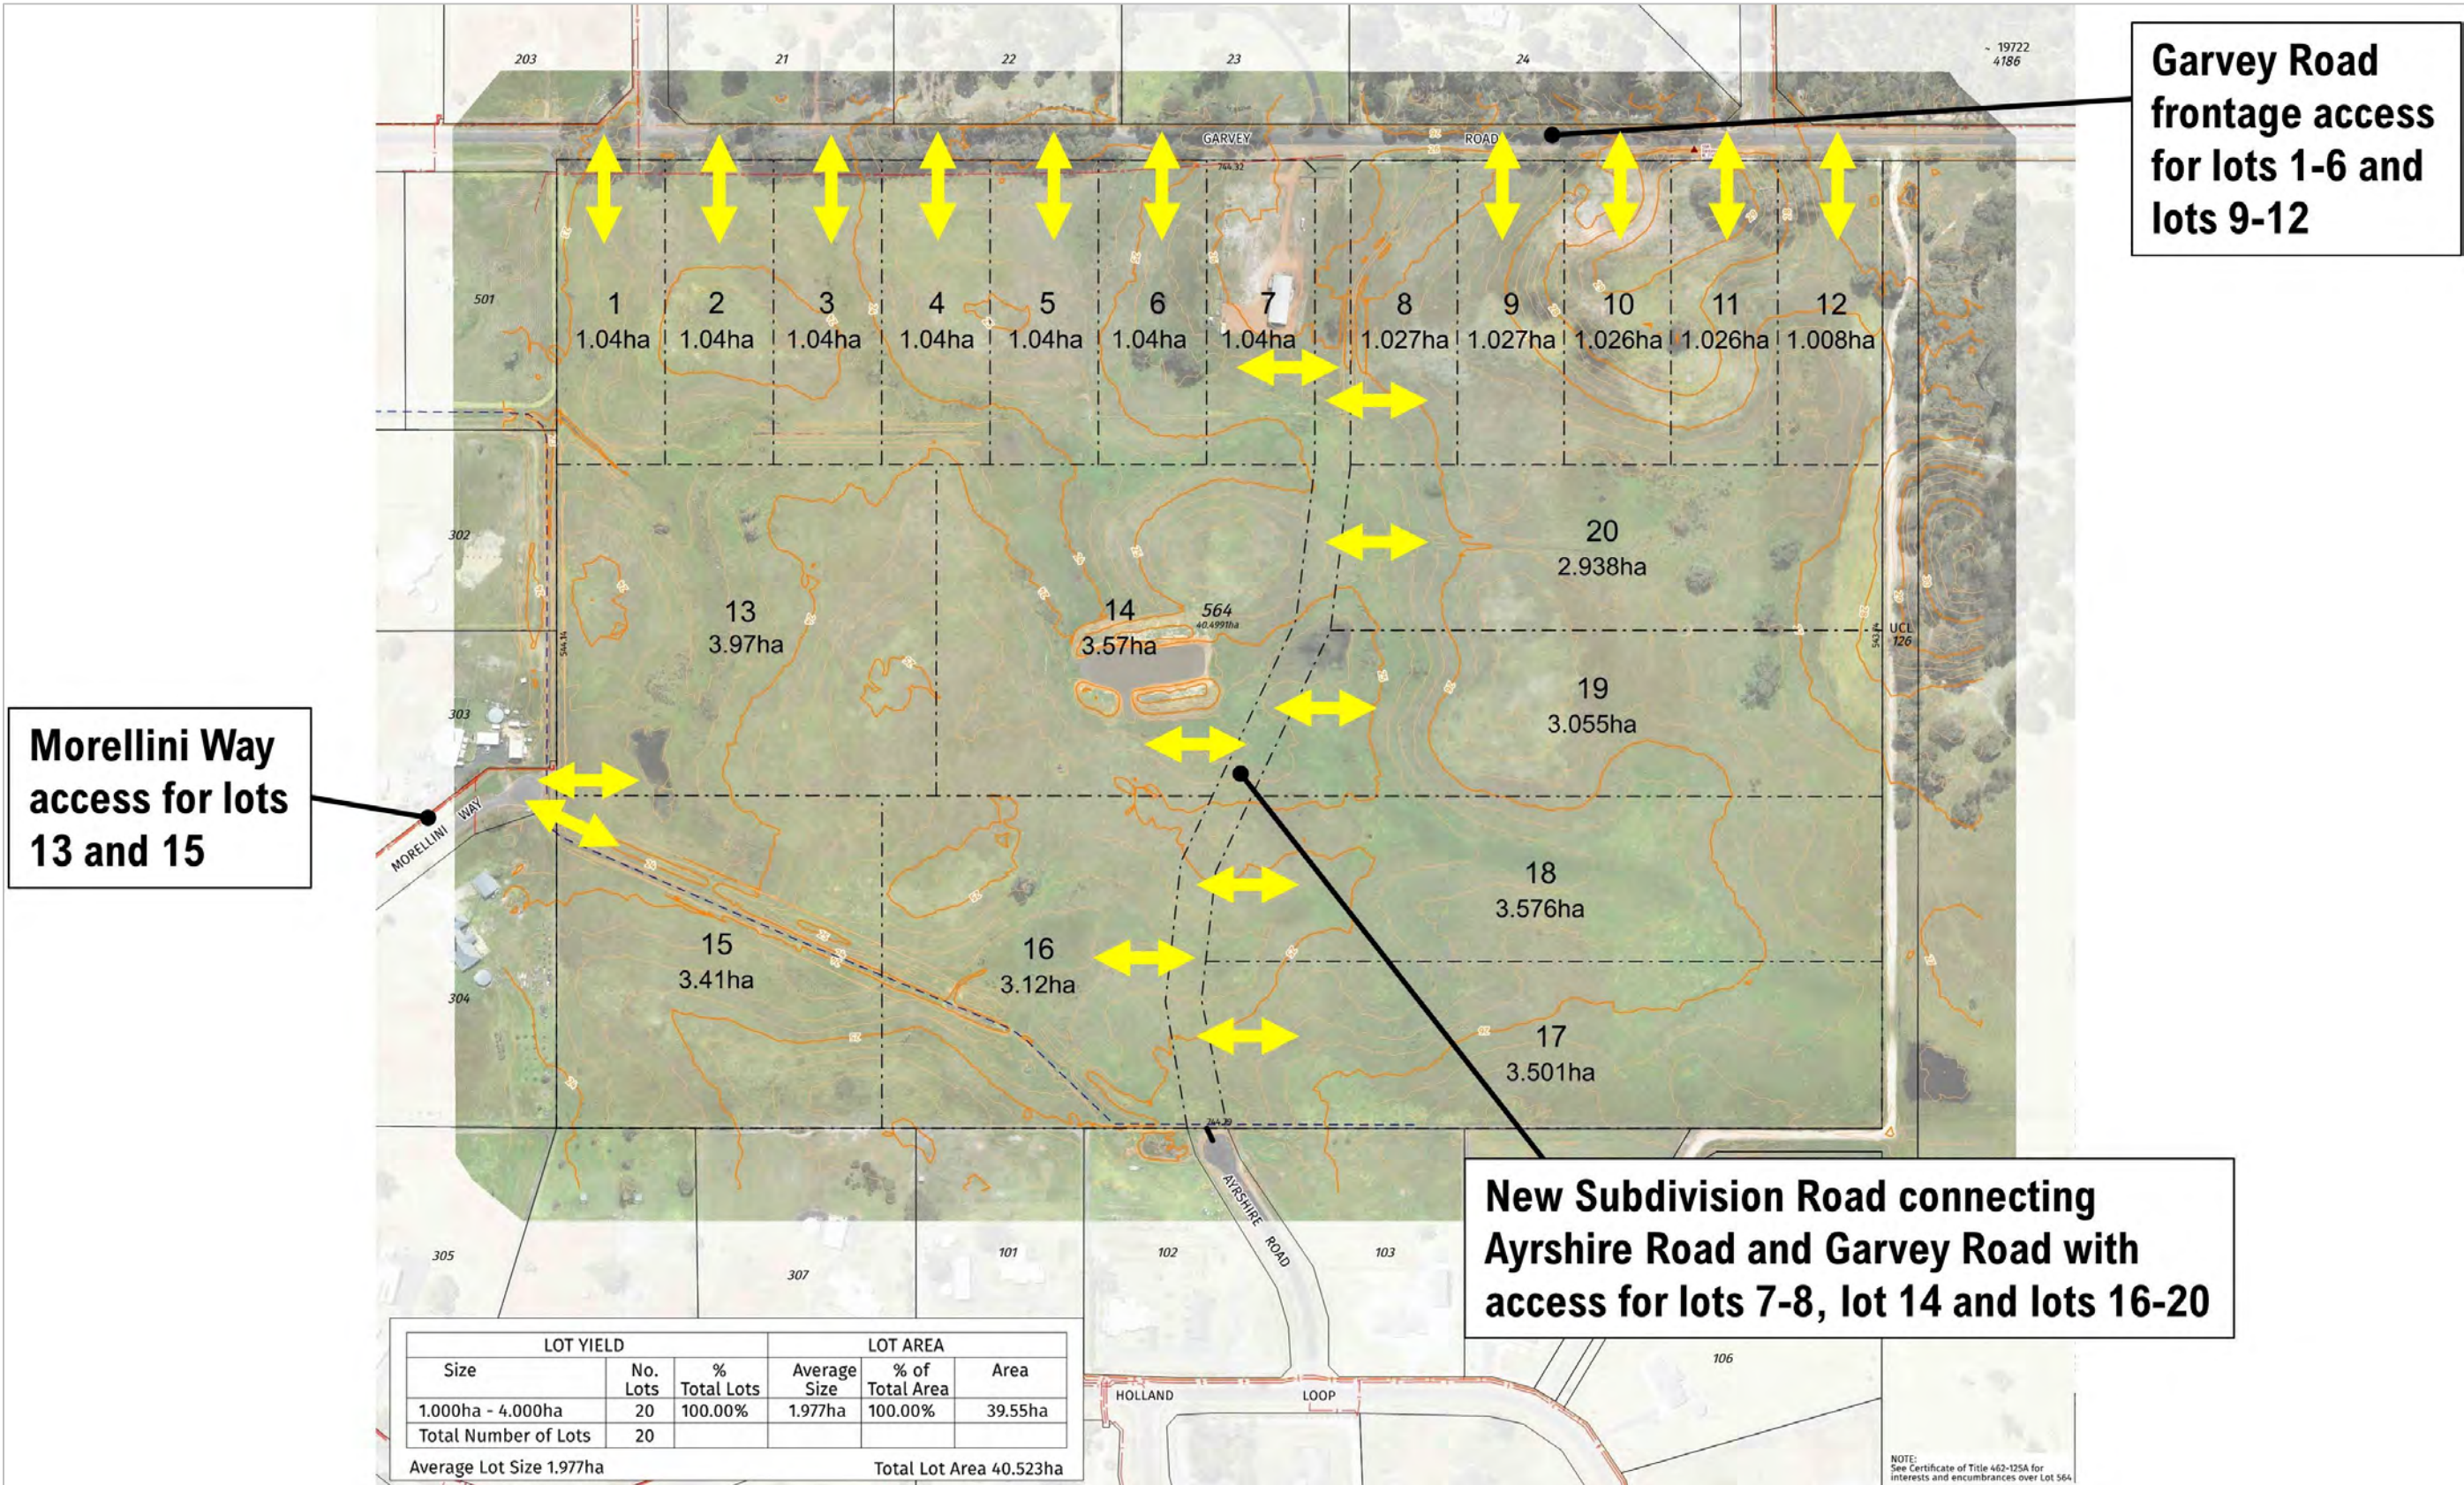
Proposed concept layout plan and access arrangements for the Lot 564 Garvey Road site (source: Harley Dykstra, June 2024)
